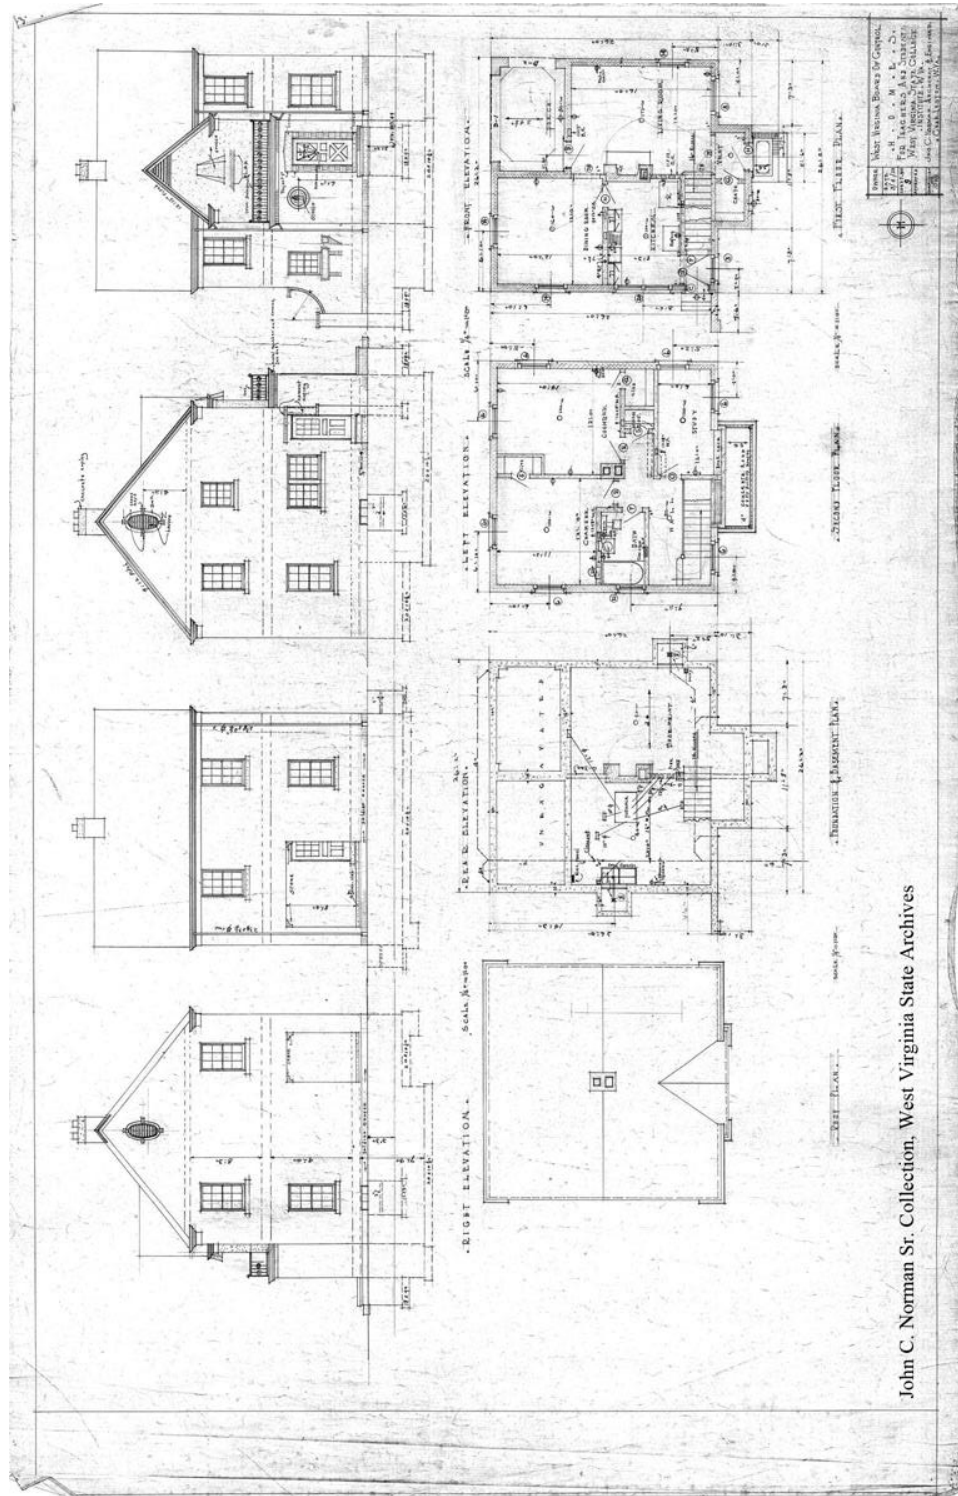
Faculty House H Floor Plan, Courtesy of the West Virginia State Archives, John C. Norman Sr. Collection
